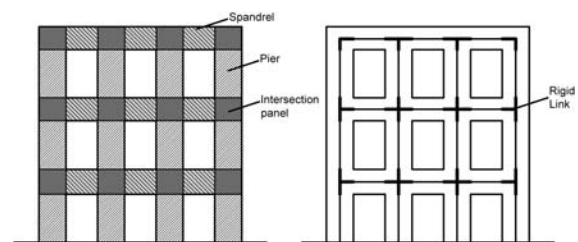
Schematic representation of equivalent frame model for masonry façade
